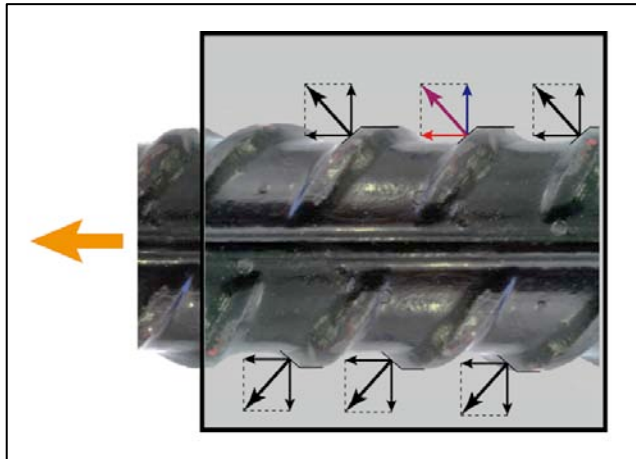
Decomposition of forces exerted by a ribbed rebar unto surrounding concrete.
